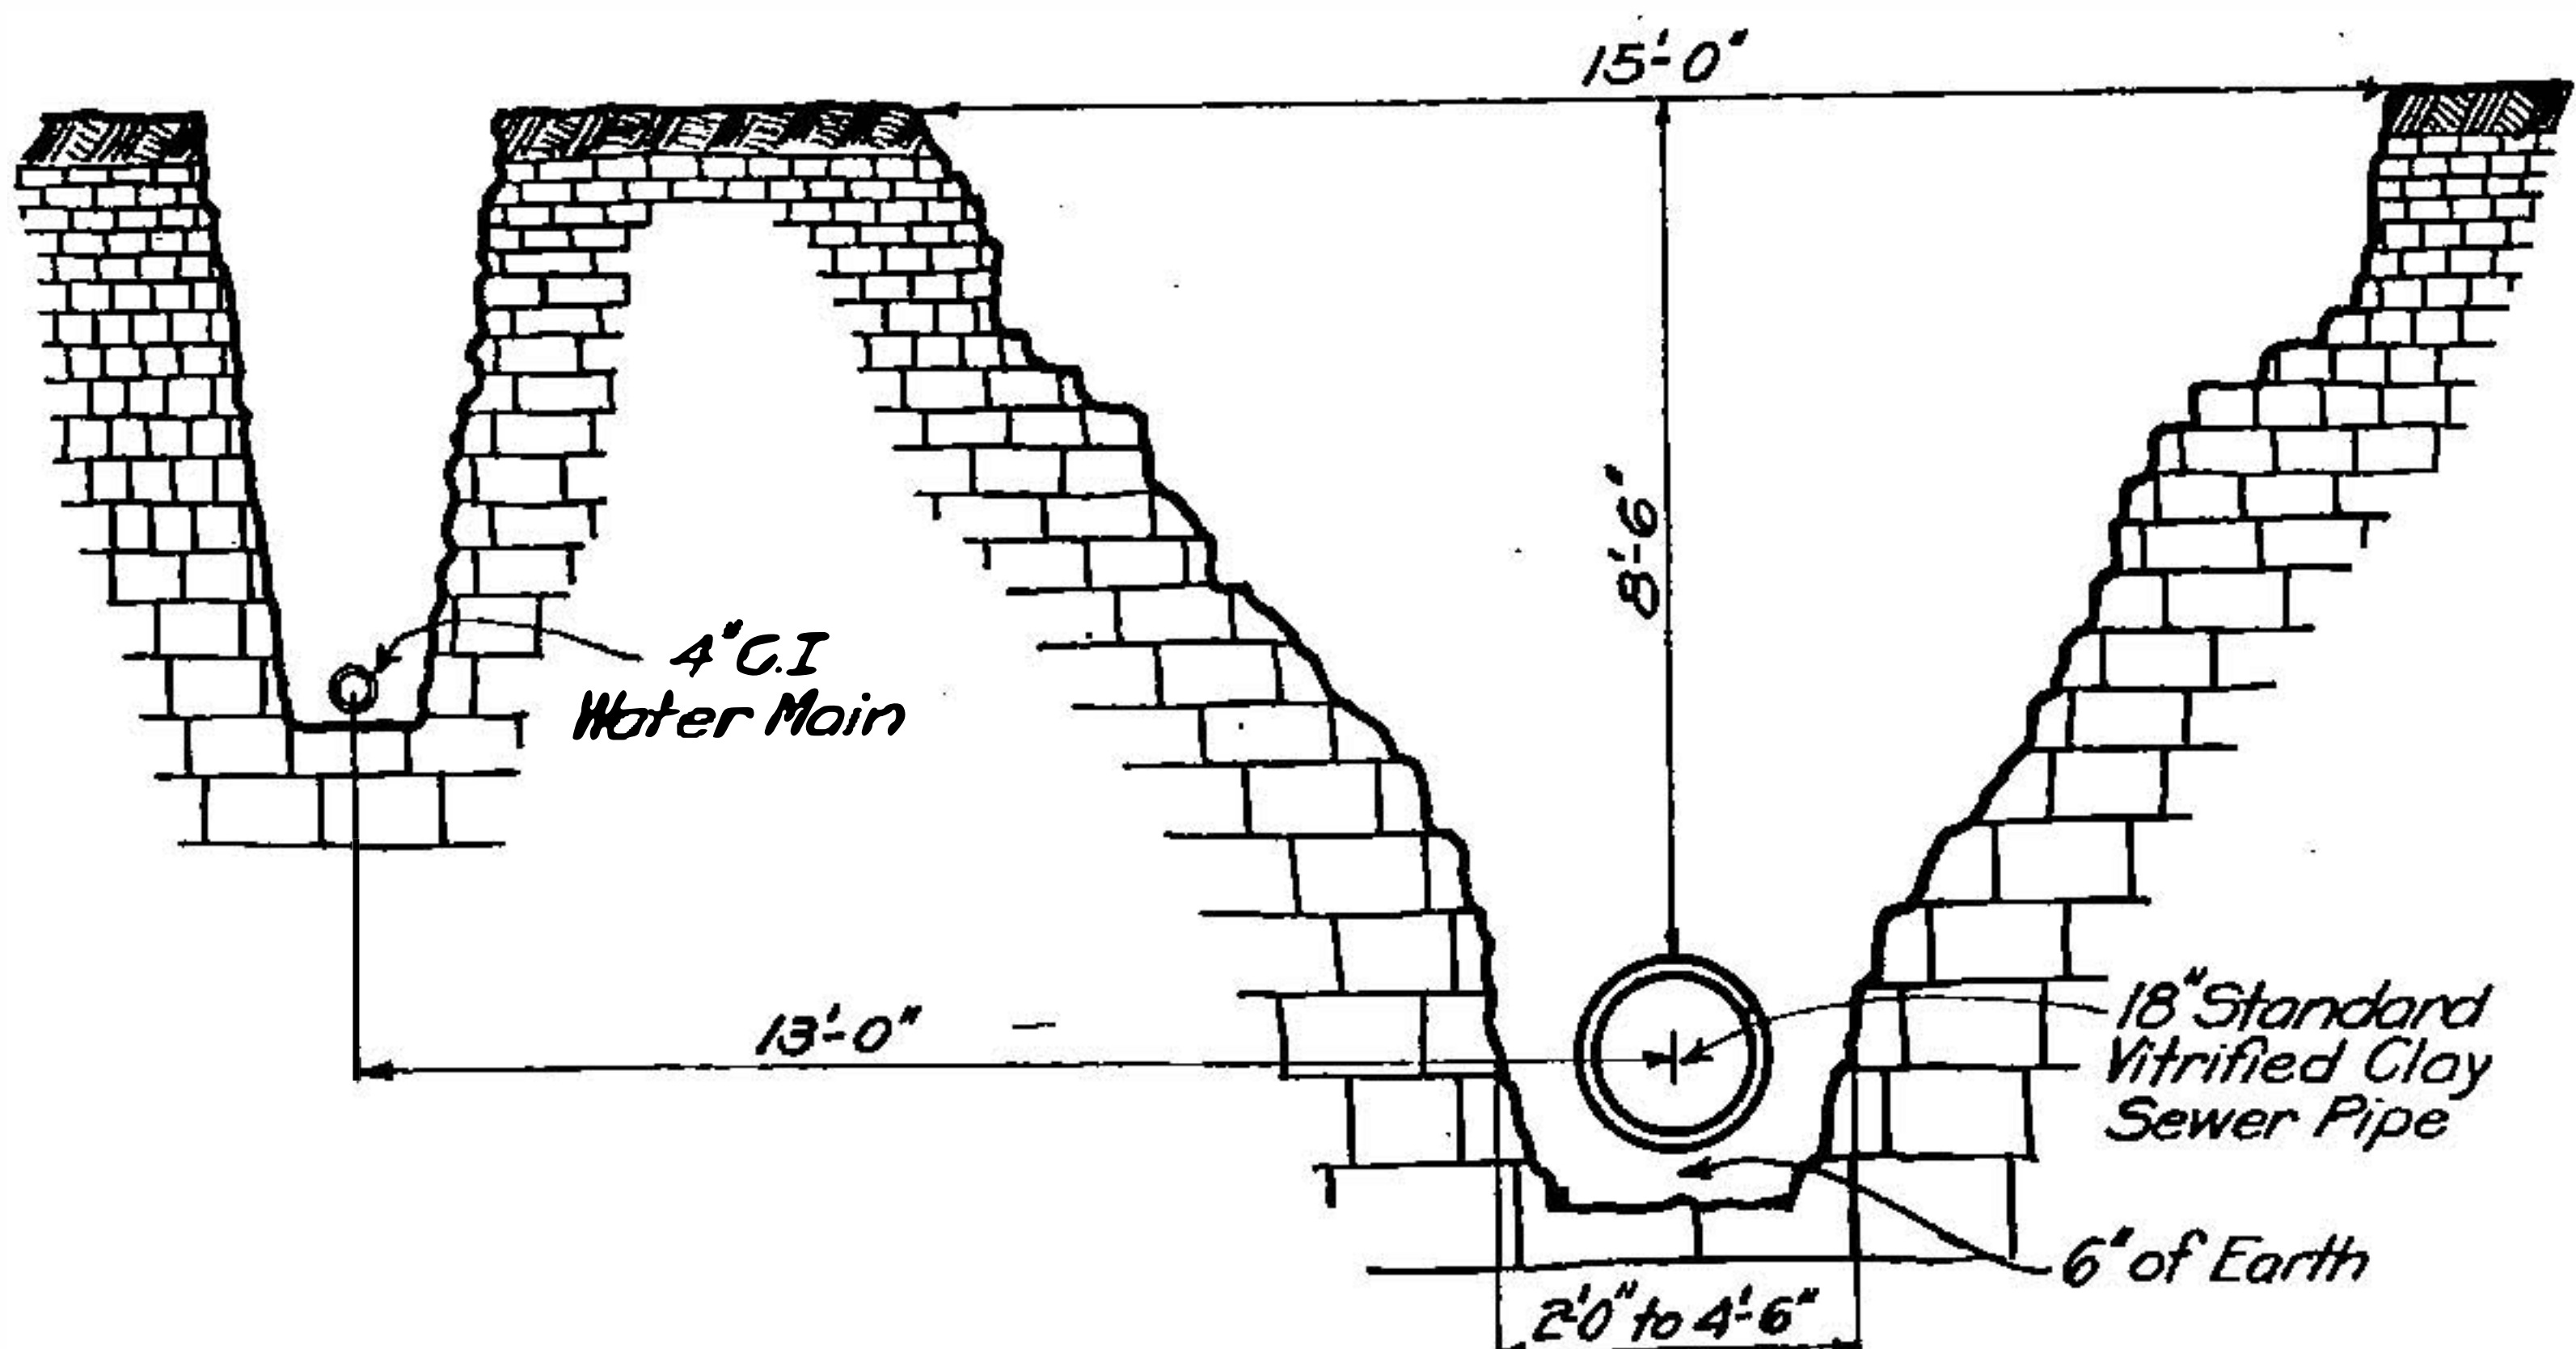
Cracking of 18 and 20 Inch Vitrified Sewer Pipe at Charles City, Iowa.
